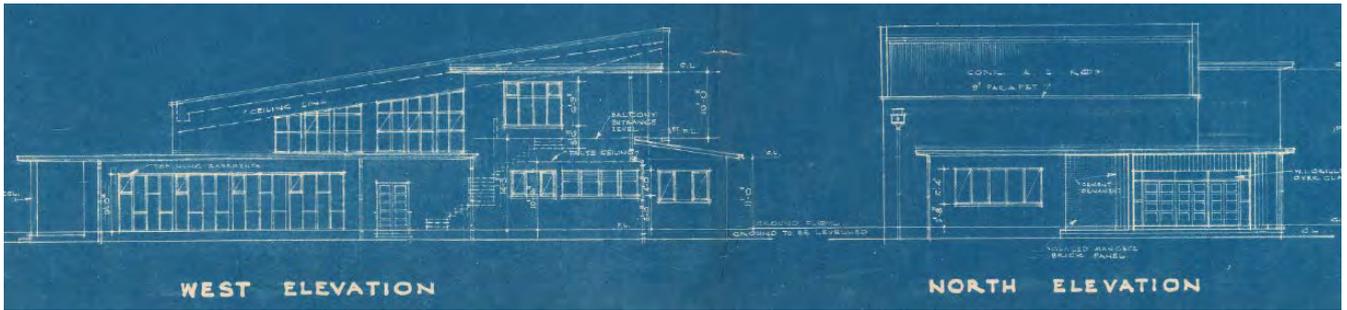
Drawings relating to building permit 2980 (K Popper, undated). North and west elevations of the proposed new synagogue. (Source: Council Building File)
